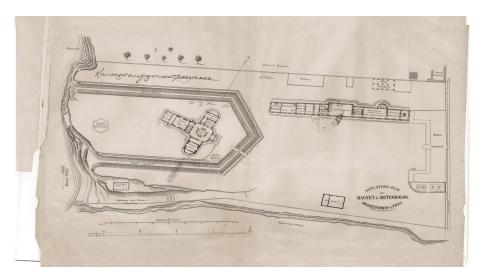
Layout plan of the Kukia observatory instrumentally surveyed and drawn by Heinrich Kiefer, 1866.
